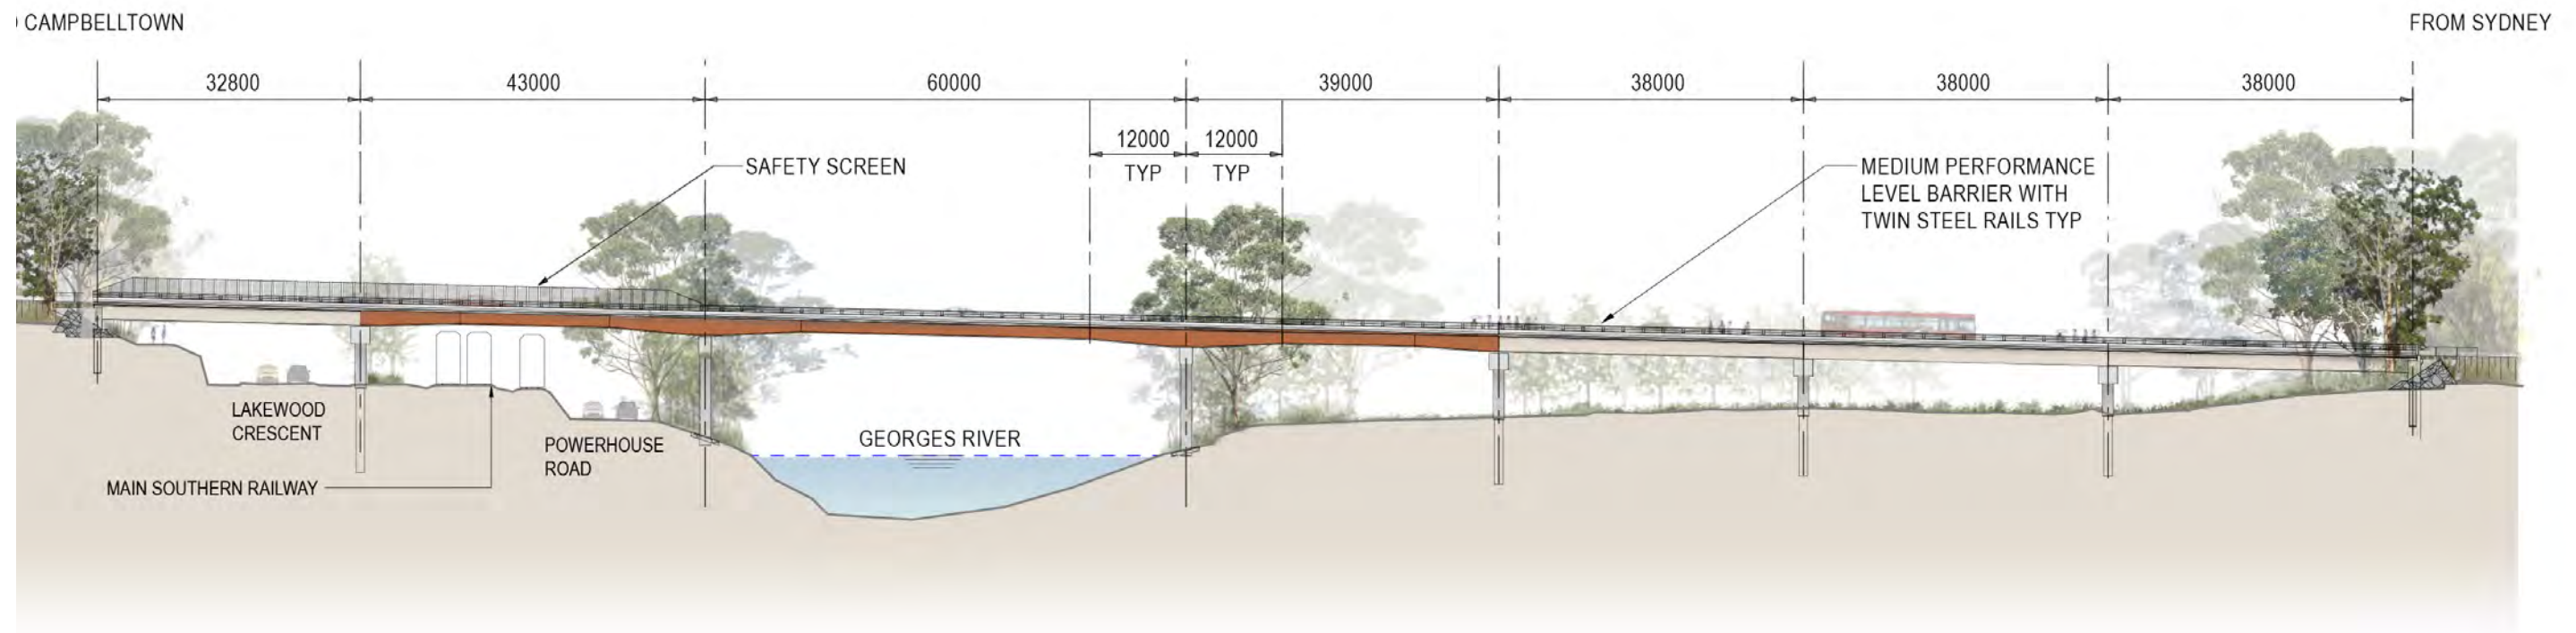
Elevation of the proposed bridge over the Georges River. NTS
